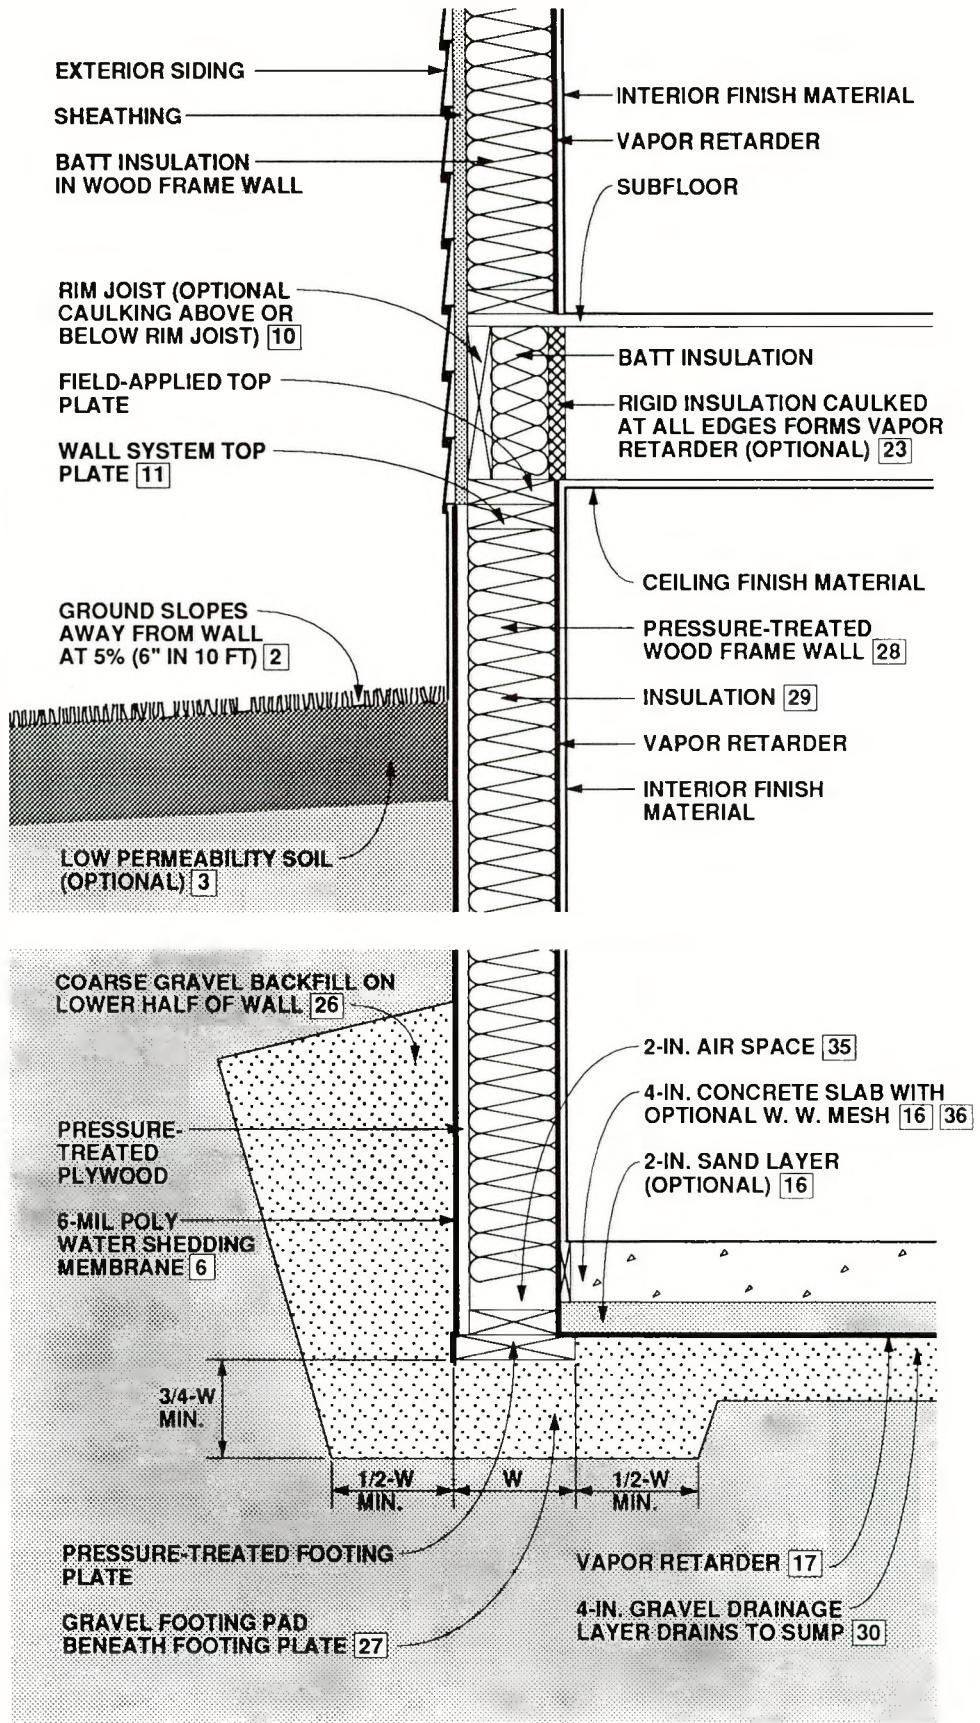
Pressure-Preservative-Treated Wood Basement Wall
